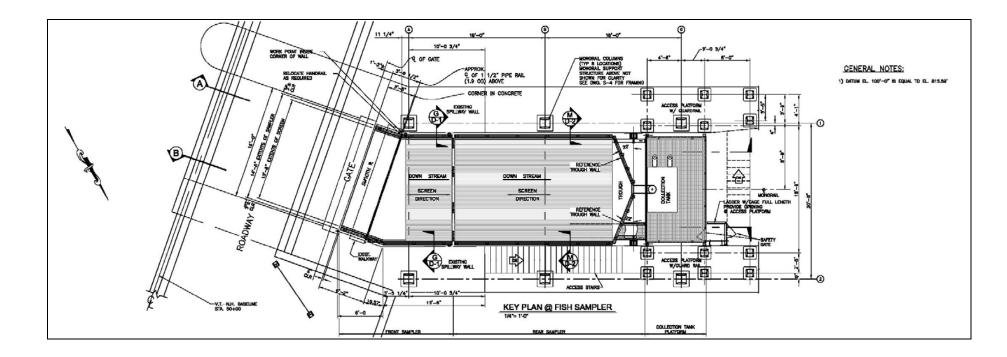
Key plan of TransCanada's Moore Development inclined plane sampler. The plan does not show flow reflectors installed after the sampler was erected. Plan drawing prepared by Kleinschmidt.
